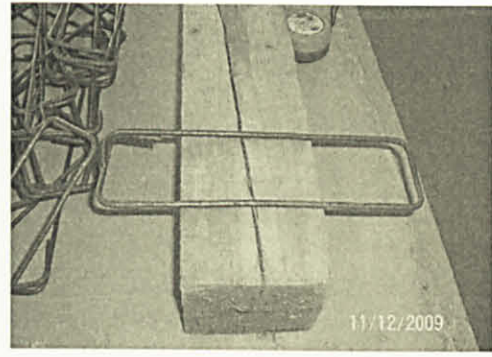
Bending of R6 links (Φ 6mm) with dimension 3"x 11" or 76mmX 280mm.
